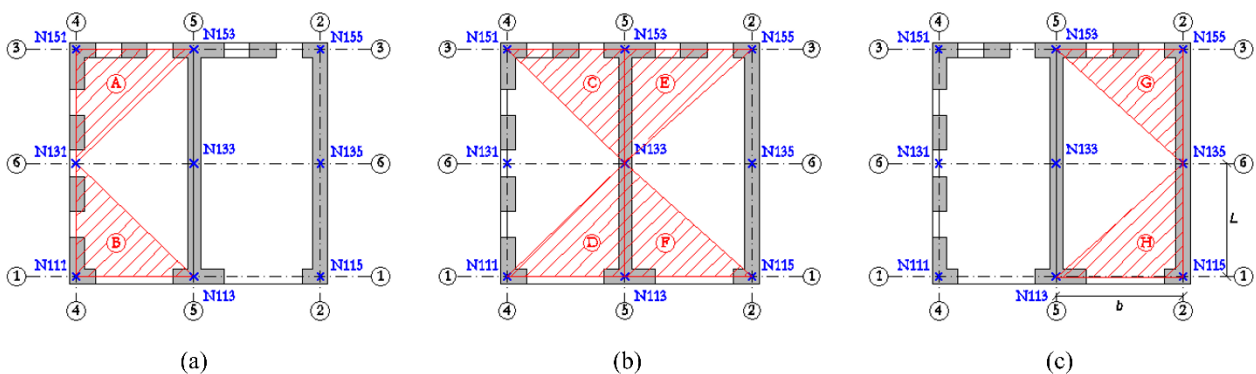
Three-nodes membranes capturing the out-of-plane stiffness component of the transverse walls in the horizontal plane: (a) North wall, (b) Central wall, (c) South wall.
